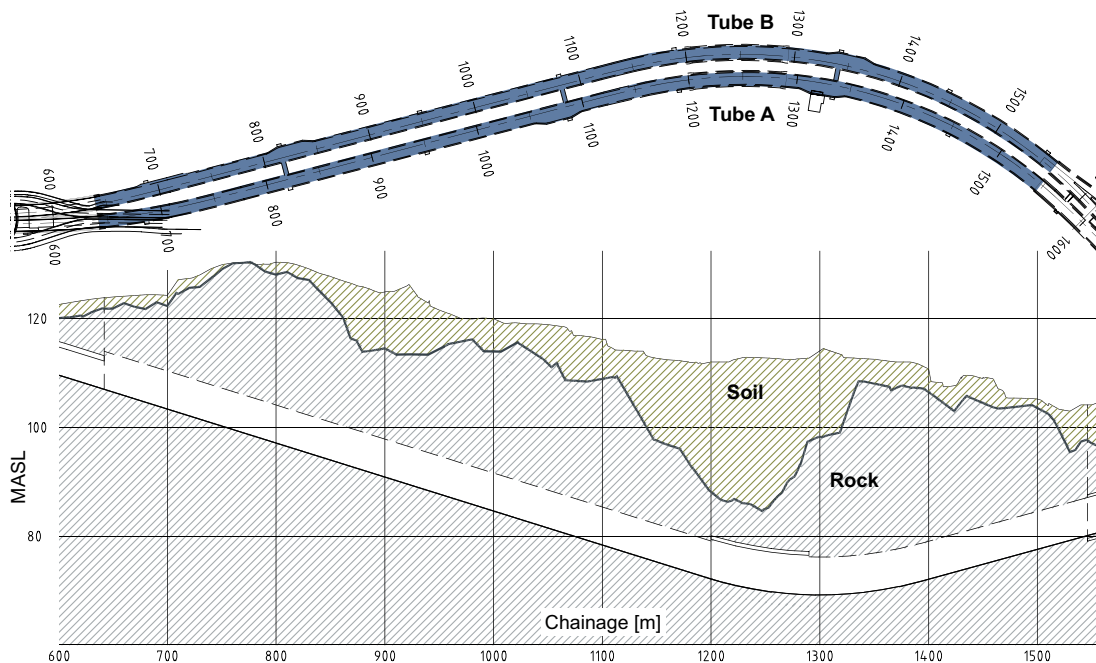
Plan view and longitudinal profile of the Løren road tunnel
